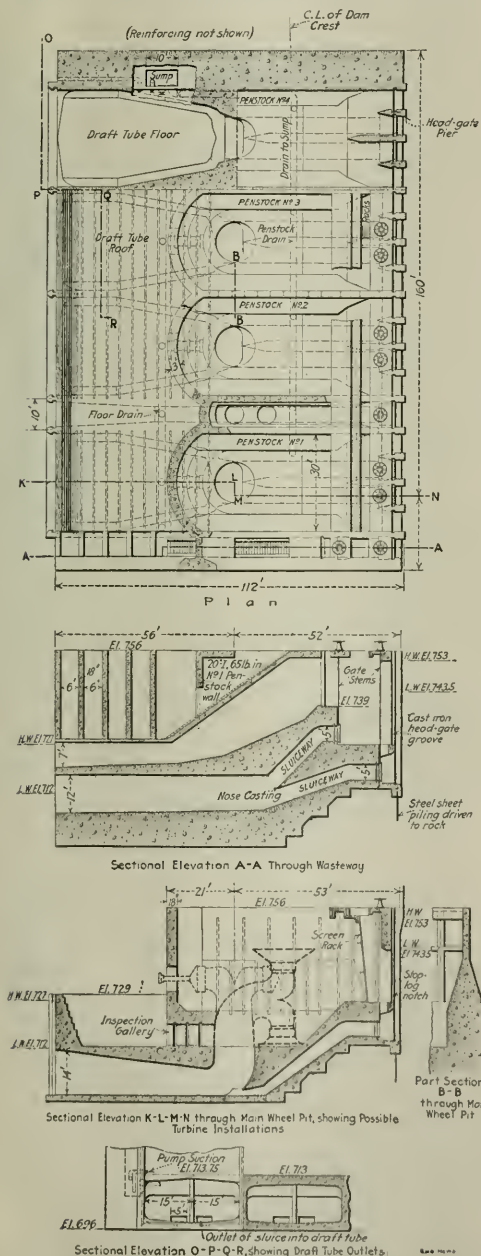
PLAN AND SECTIONS OF POWER-HOUSE BASE.
